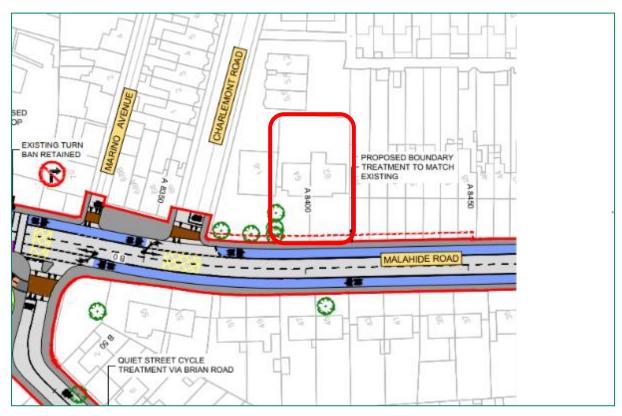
Proposed new Layout at Winston Ville 62 and 64 Malahide Road
